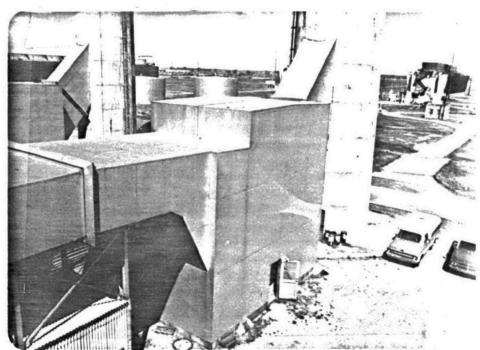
View from the boiler house looking northwest. Stacks 1 and 2 and their lead-in ducts are shown in the foreground of the photo. Cooling towers and oil storage tanks are shown in the background.
